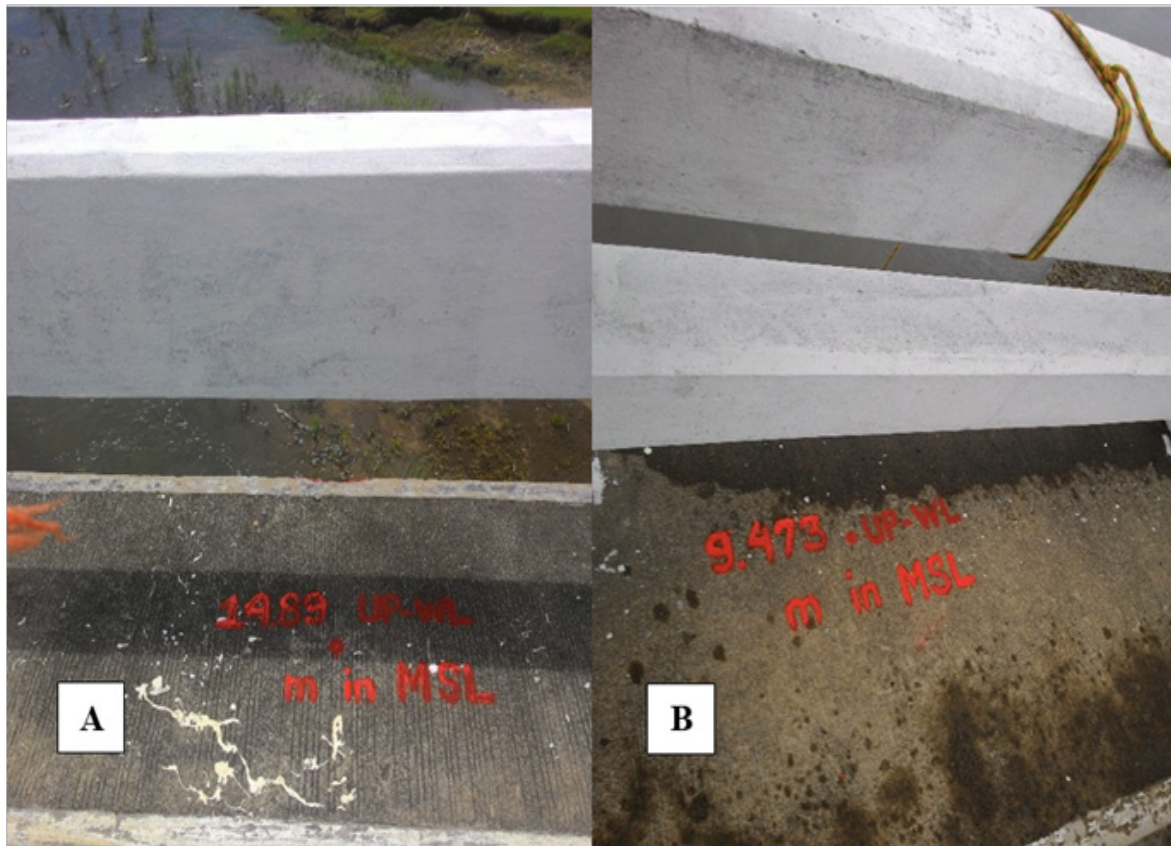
Water-level markings on the deck of A) Burgos Bridge, and B) Santa Maria Bridge
